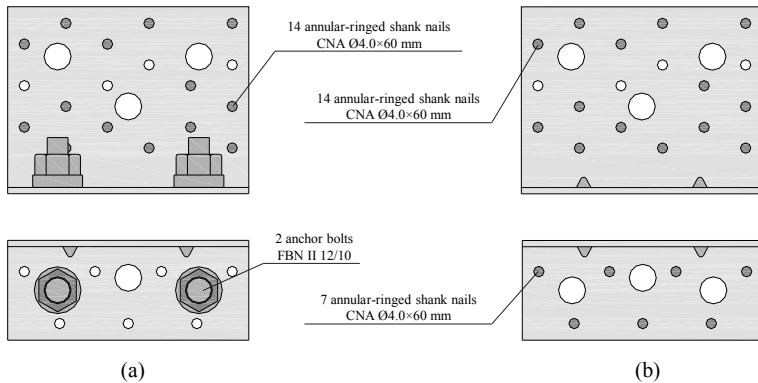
pattern of fasteners for angle bracket AE116 – (a) applied for wall-to-foundation joints; (b) applied for wall-to-floor joints
